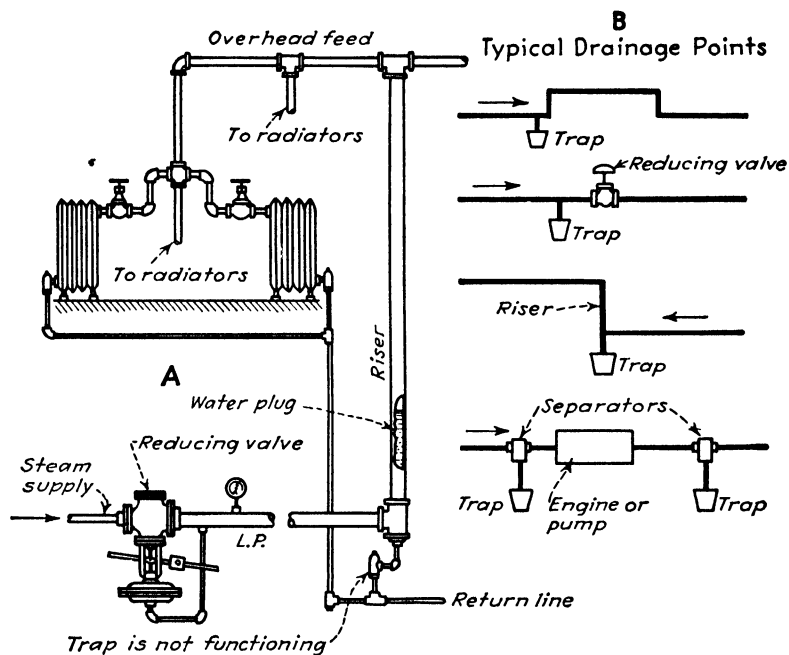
(A) If the riser trap fails, water leg builds up pressure on control-valve diaphragm, and it shuts off the steam. (B) Typical drainage points.
